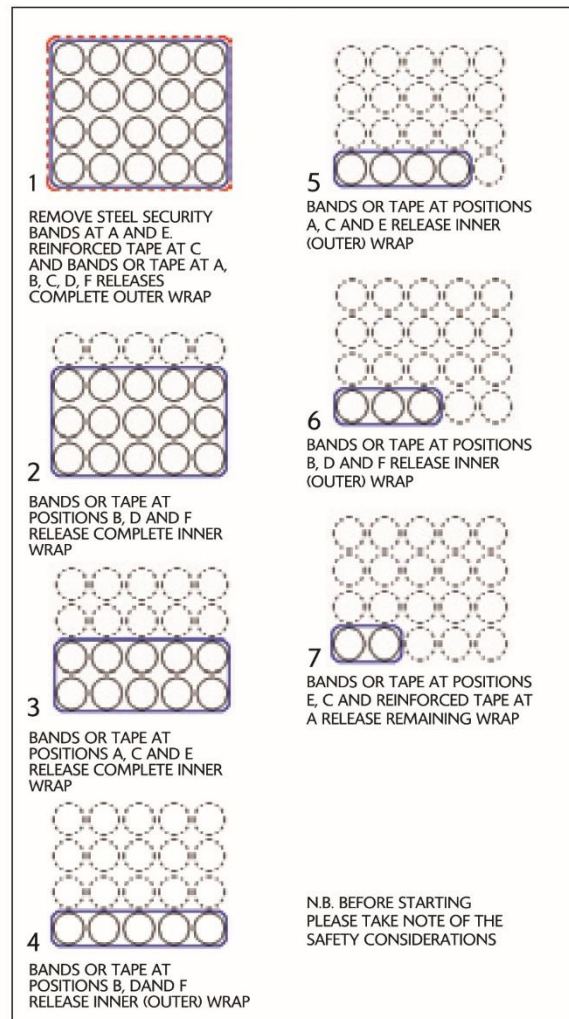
Releasing Instruction for coiled Pipe Retaining Straps
